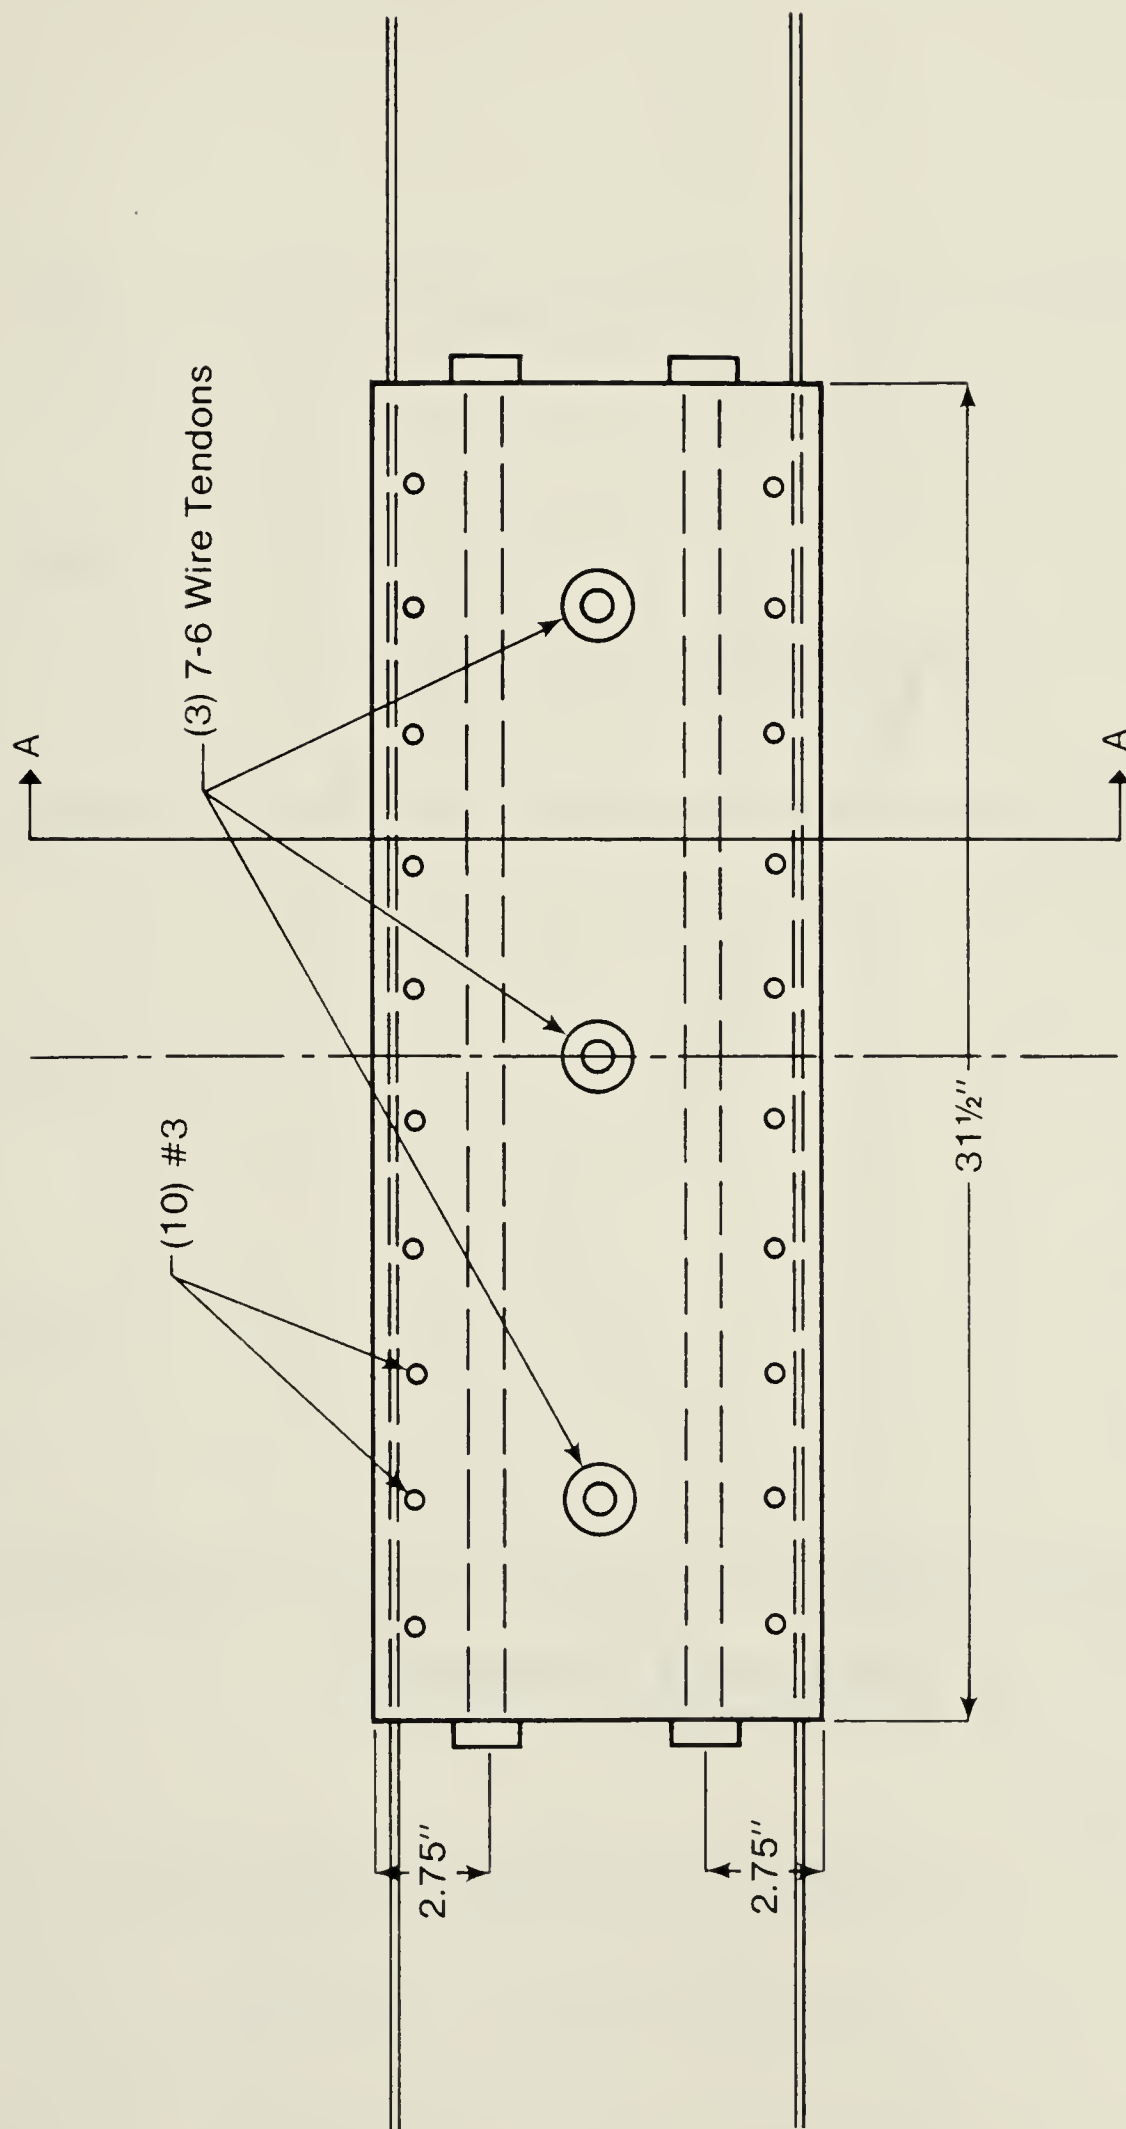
Typical Test Segment Cross-Section Orthogonal to Direction 2
